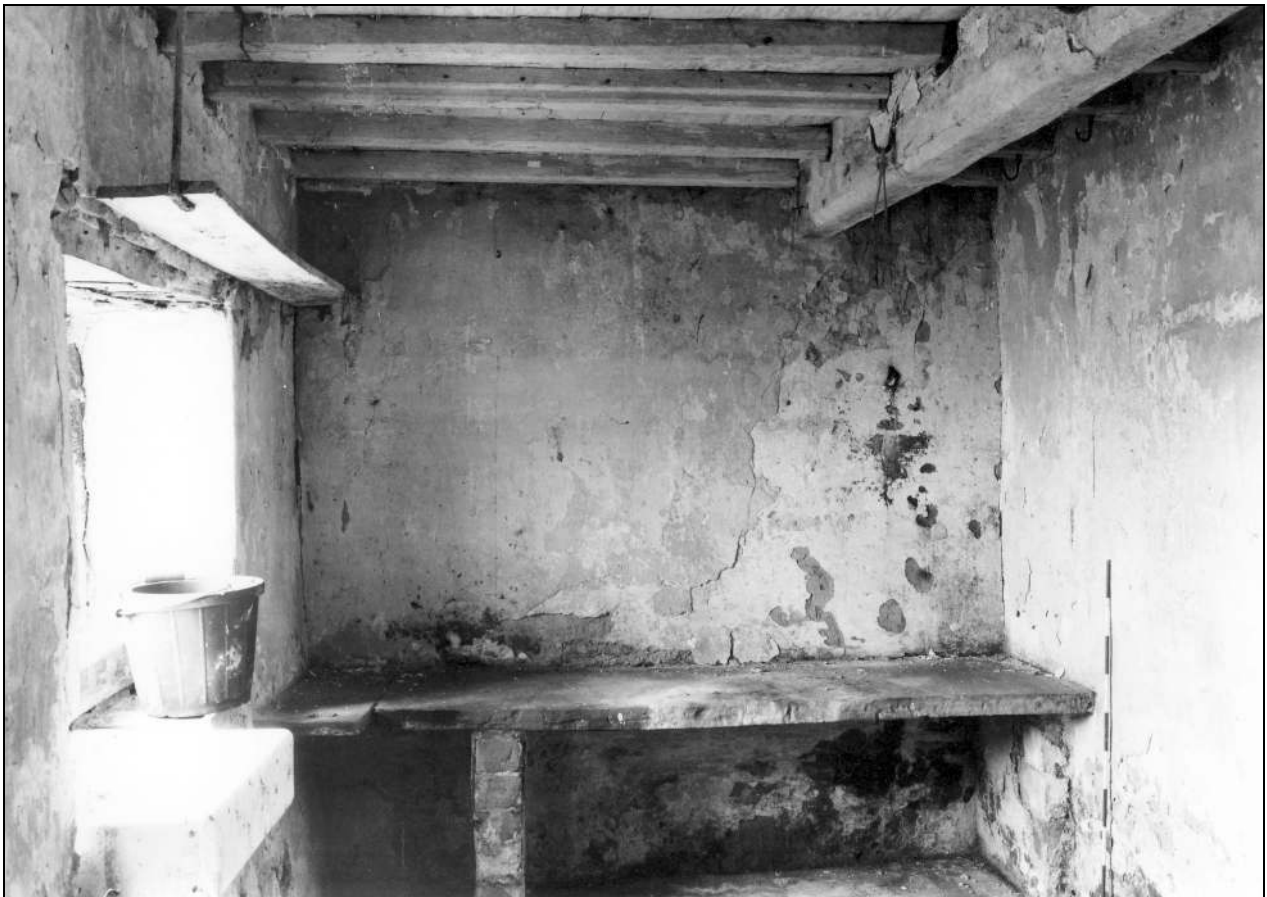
Wash-house or scullery within former parlour, from the east (film 1, frame 18)
